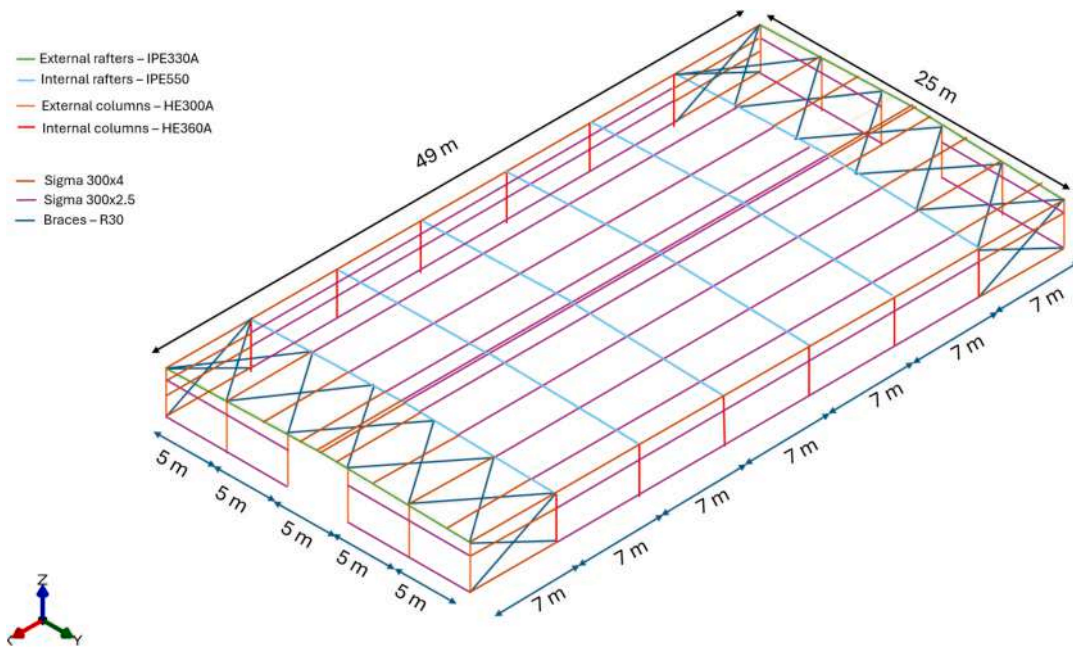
Layout of the steel single-storey steel structure in SAFIR.
